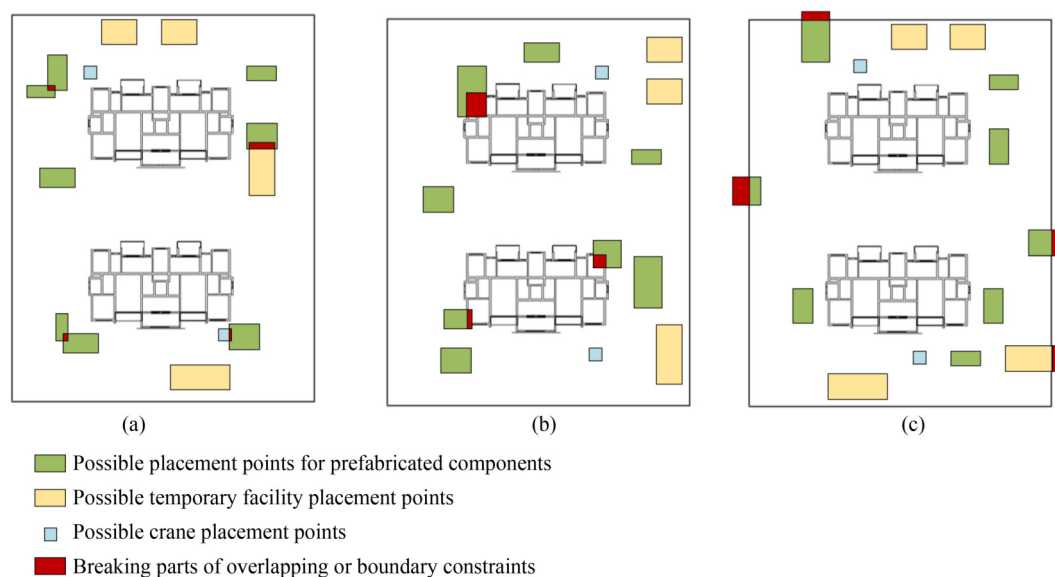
Layout situations that do not meet boundary and overlapping constraints.
